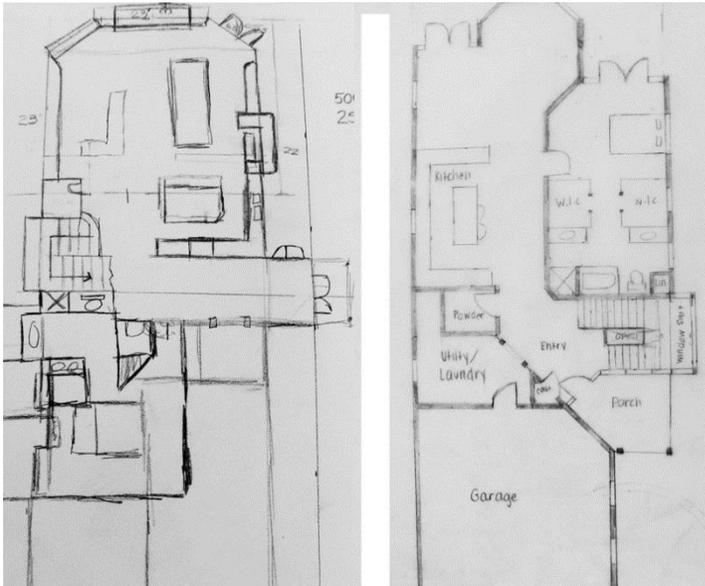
Study Drawings. Single line layout (left) and preliminary scaled floor plan (right)
